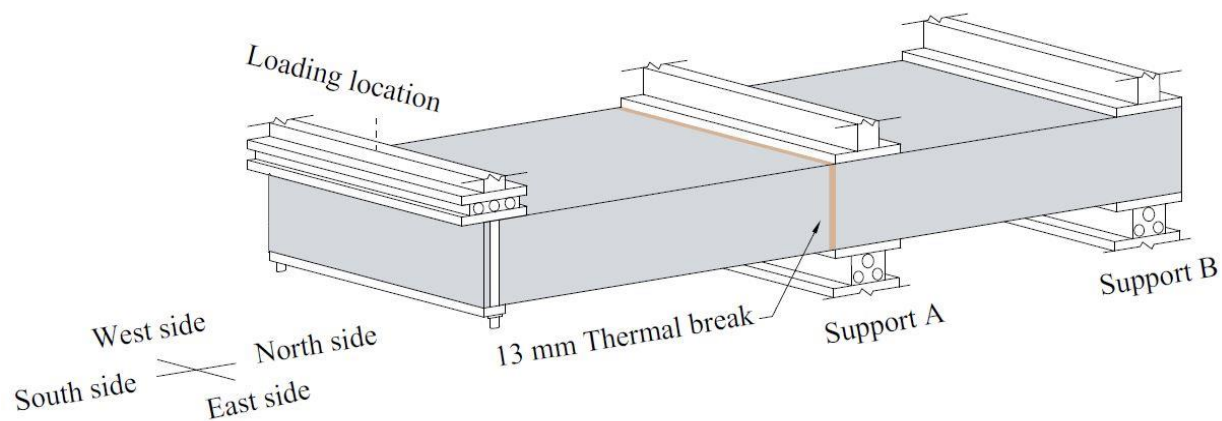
Naming of slab sides, supports and location of load at the tip of the cantilever slab
